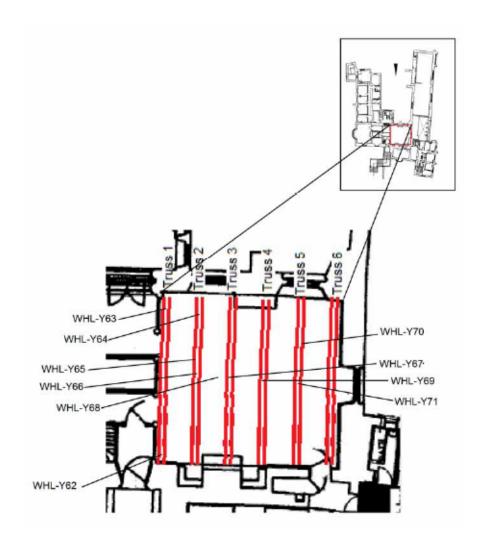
Plan of the great hall, showing the location of samples WHL-Y62-71 (Ashworth Burke Partnership)
